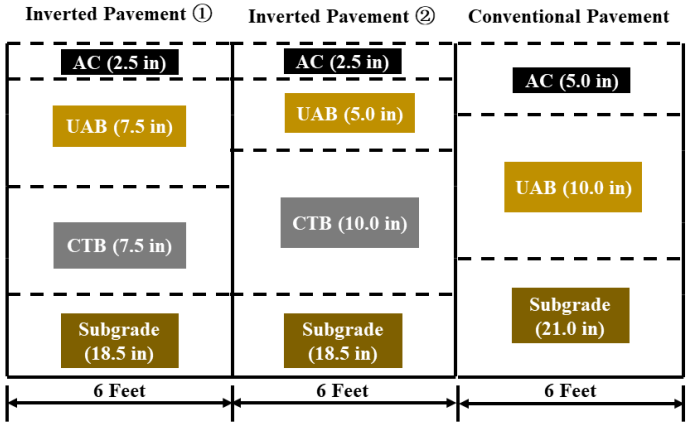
Pavement structures in models (1 inch = 2.54 cm; 1 foot = 30.48 cm).
